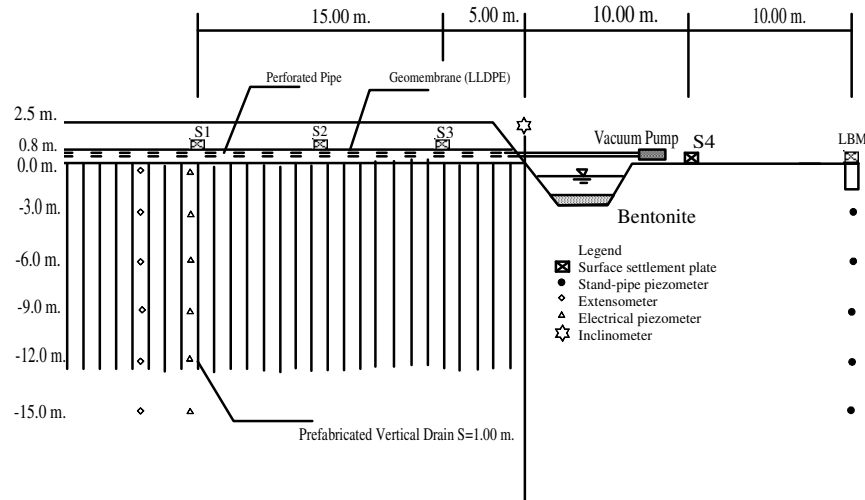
Vertical cross section at embankment TV2 with instrumentation locations (adapted from Indraratna et al. 2005b)
